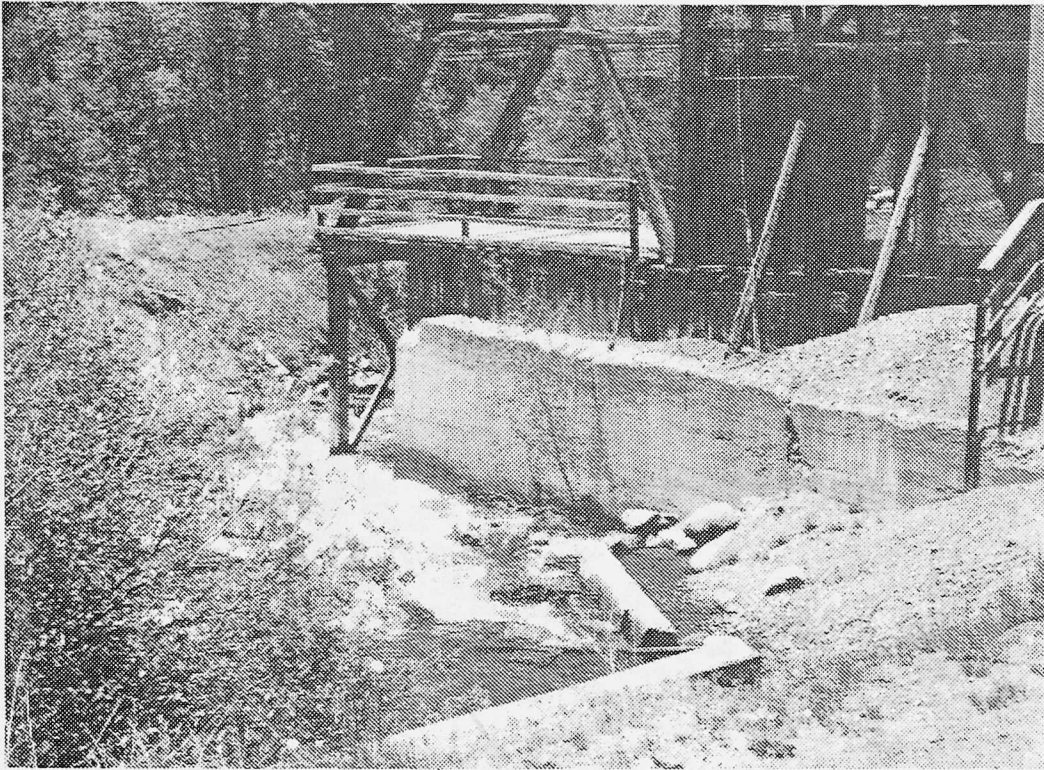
Looking westward at the Atlantic Cable shaft with concrete flood protection wall.
